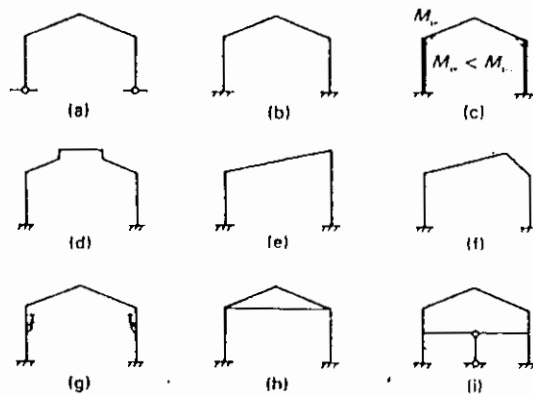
Types of single-storey portal frames: (a) pinned-base; (b) fixed base; (c) heavier column sections; (d) monitor roof; (e) lean-to; (f) north light; (g) including crane; (h) tied; (i) intermediate floor. (After ref. 11.)
